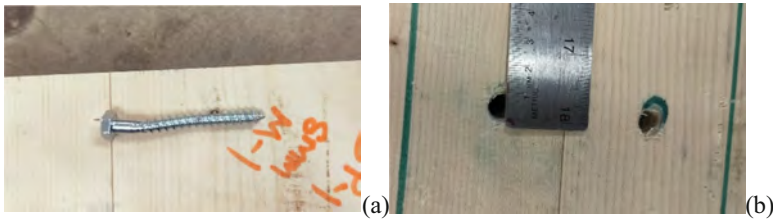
Details after disassembly: a) deformed screw, b) timber hole ovalisation.
